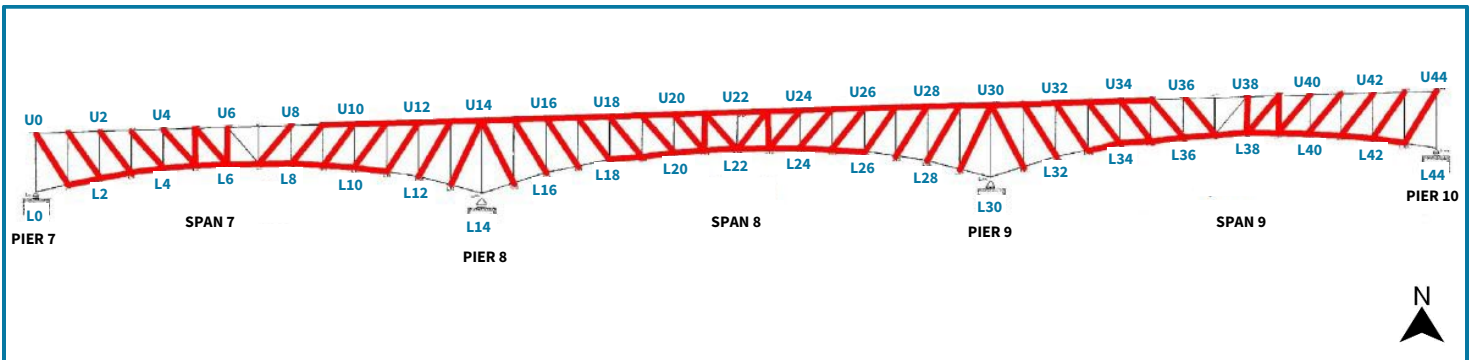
HAM-50-2180N Bridge Nomenclature (Truss Layout and NSTMs - Spans 7 to 9)
